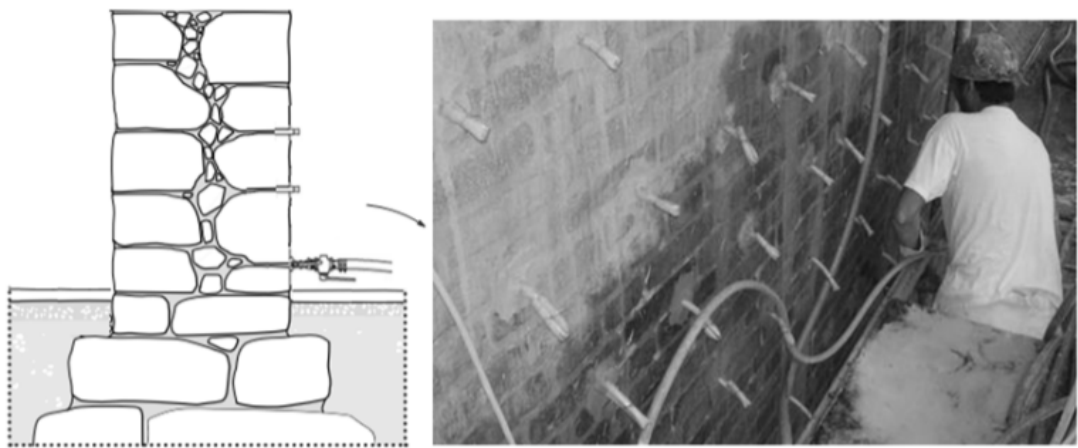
Detail of the grout injection on a stone masonry wall (Baltazar, L. G., Henriques, F. M., & Cidade, M. T., 2019, p:2)
